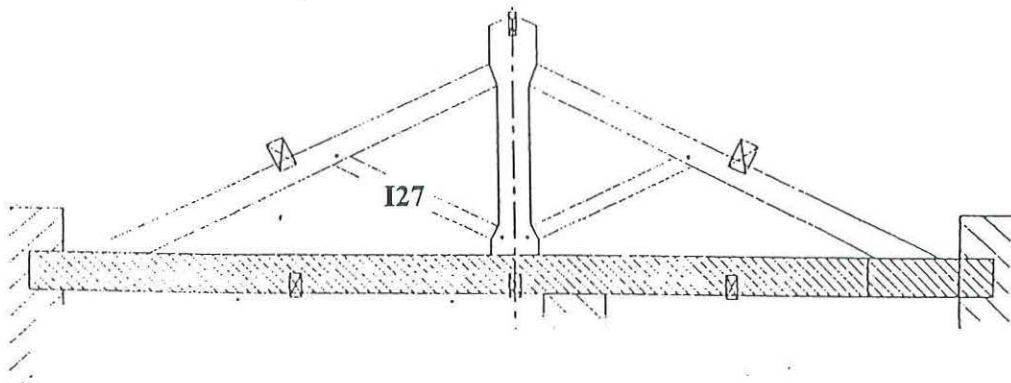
Drawing to show positions of samples from the trusses of the stable roof
